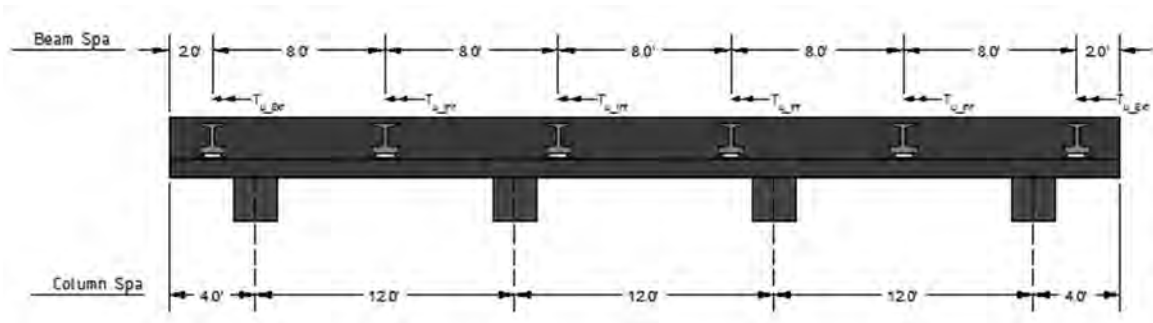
Elevation View of 30 Degrees Skewed ITBC with Torsion Loads
